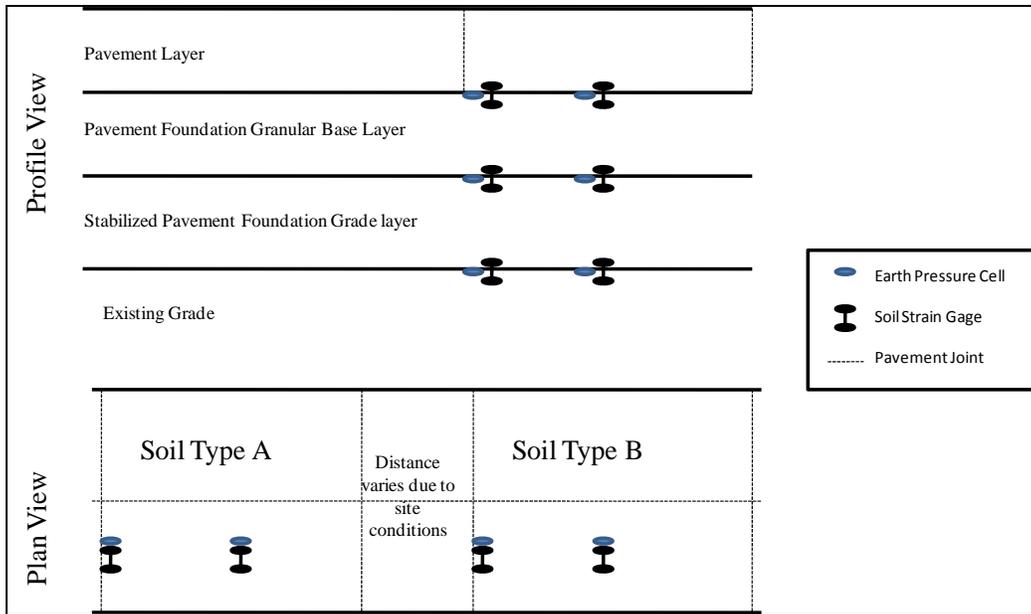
Schematic of in-ground instrumentation installation (similar to Pillappa 2005)
